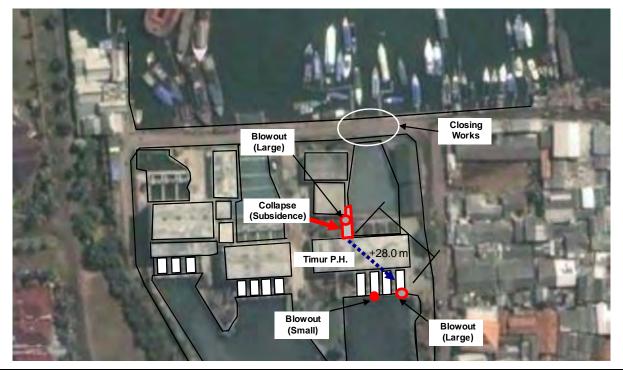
Location of Piping at East Pump House (on 18/Feb/2009)
